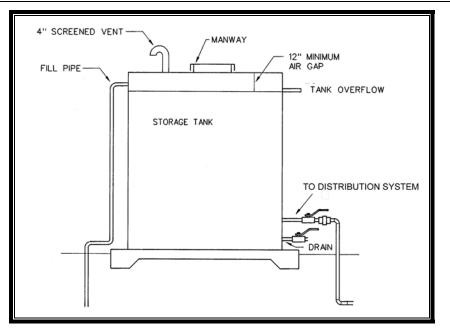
3 Typical Ground Storage Tank Piping Detail
